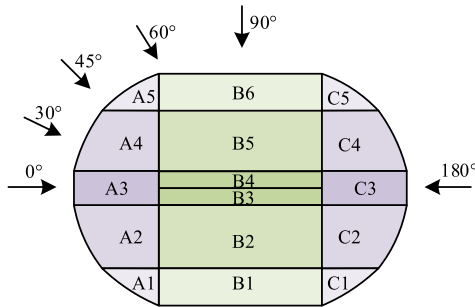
Surface wind pressure zoning diagram of folding grid shell roof.
